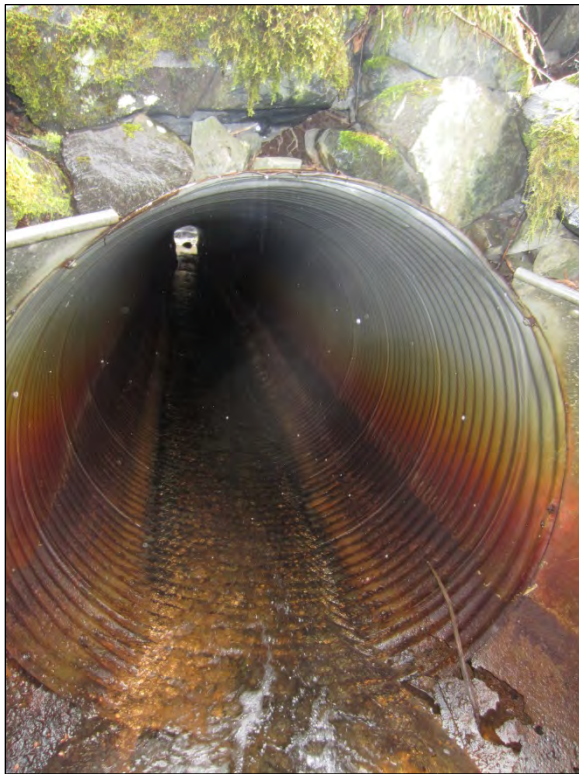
Looking downstream at inlet of 60-inch CMP crossing Peterson Avenue.
